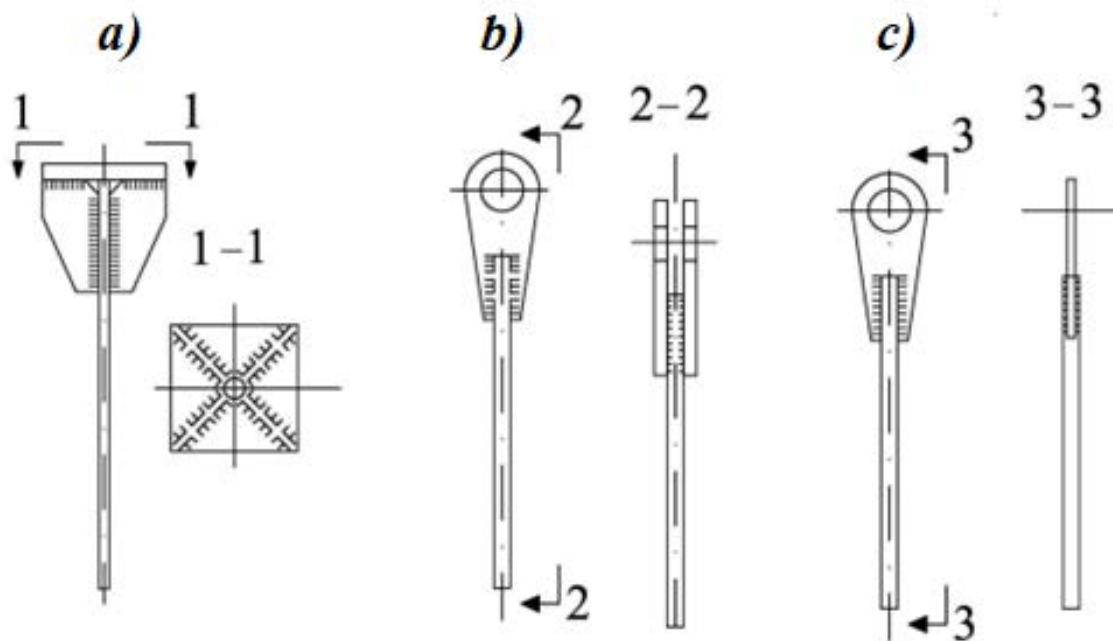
End fittings for cable stays made of reinforcing bars
